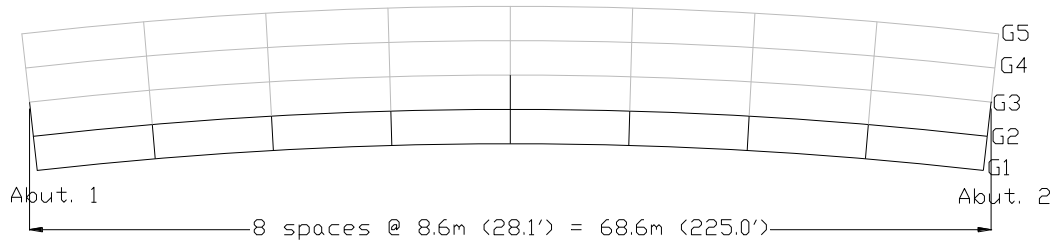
Stage 2 of Construction for Single Girder (Inner Girder Placed First) Erection of Single-Span, 5-Girder, 305-m (1000-ft) Radius Bridge.
